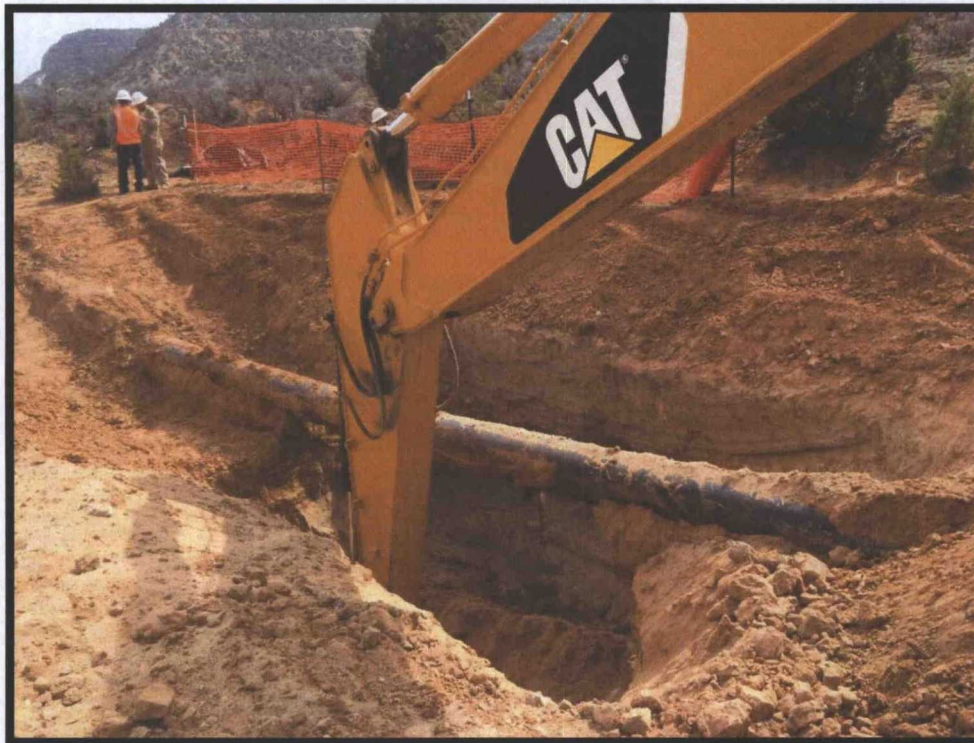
Trunk K #6 Excavation nearing maximum extent.
